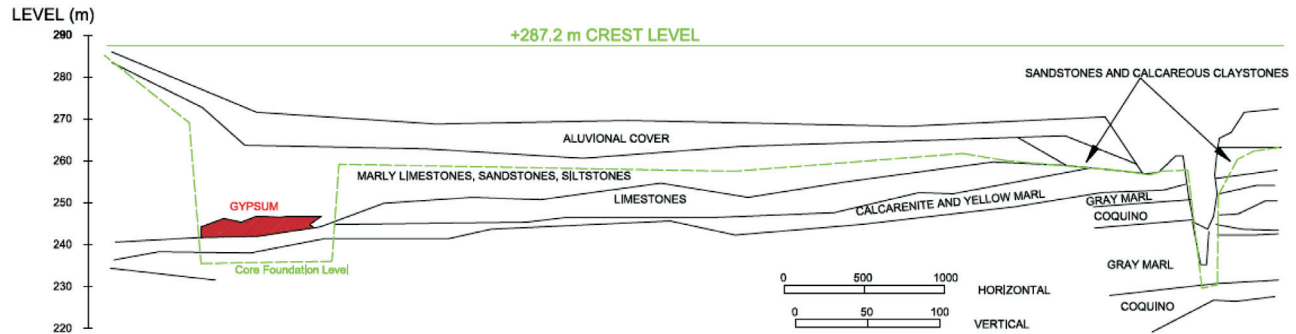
Longitudinal profile, showing location of the gypsum stratum.
